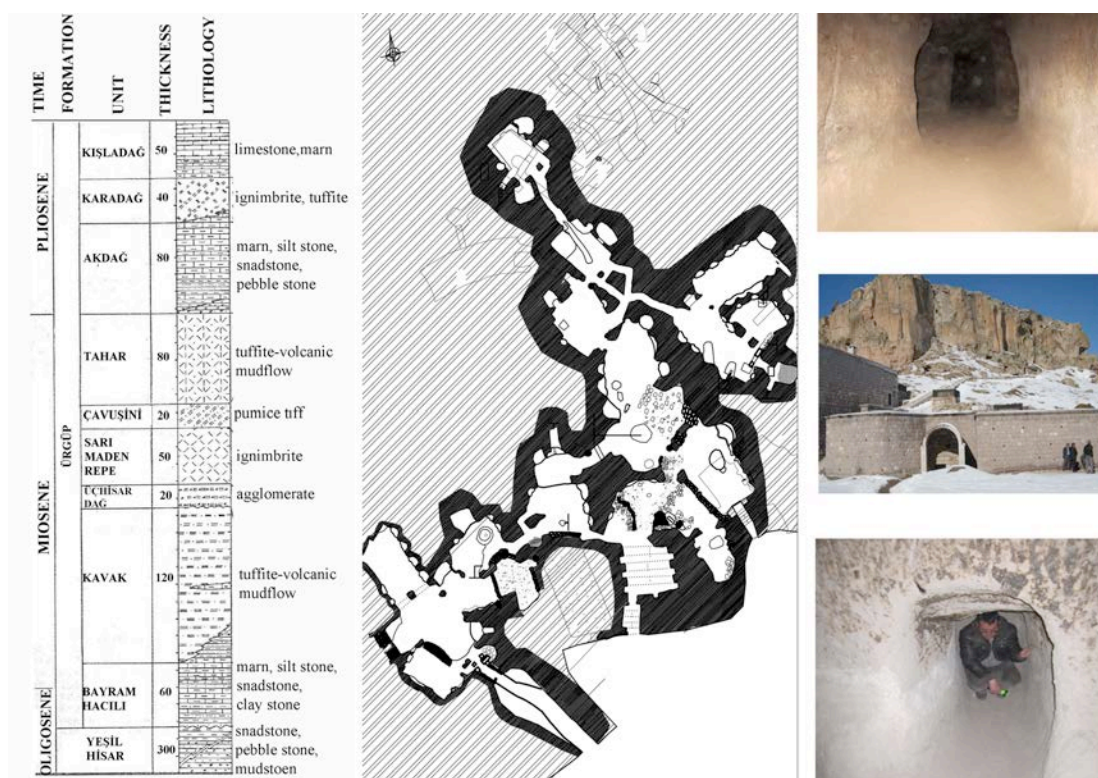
Generalized Urgüp formation and its units, ground floor plan of Mazi Underground City and general view of Mazi Underground City from inside and outside (Foundation of Istanbul Technical University Mining Faculty, 2008 and Nihal Ergun Architecture, 2008)
